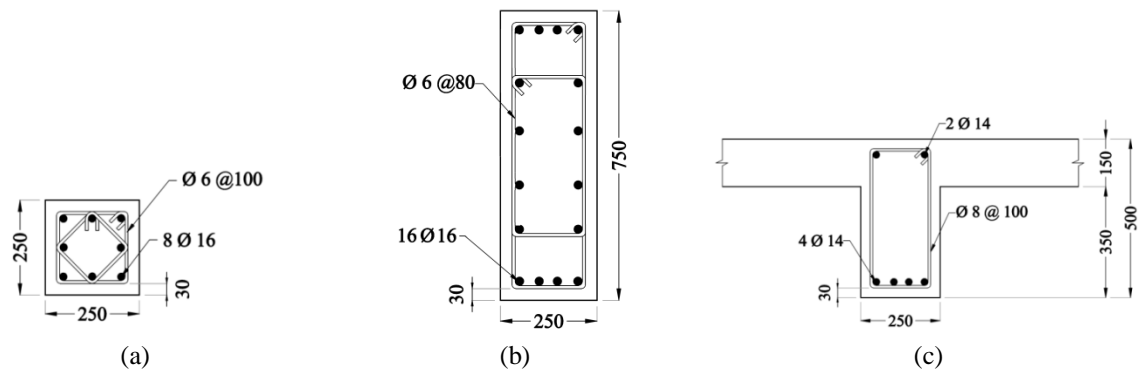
Cross-section details of Test 0.15 building (a) square column, (b) rectangular column, and (c) beam (all dimensions are in millimetres).
